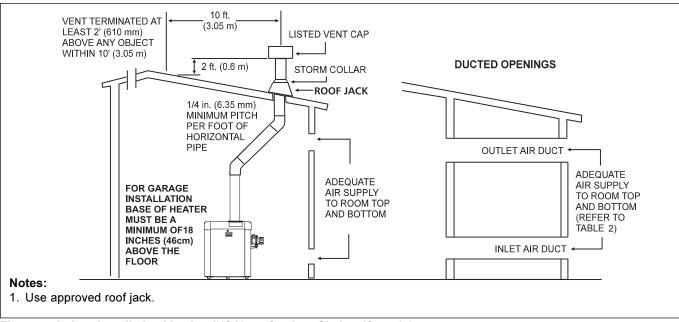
Indoor Installation Venting (USA), or Outdoor Shelter (Canada).
